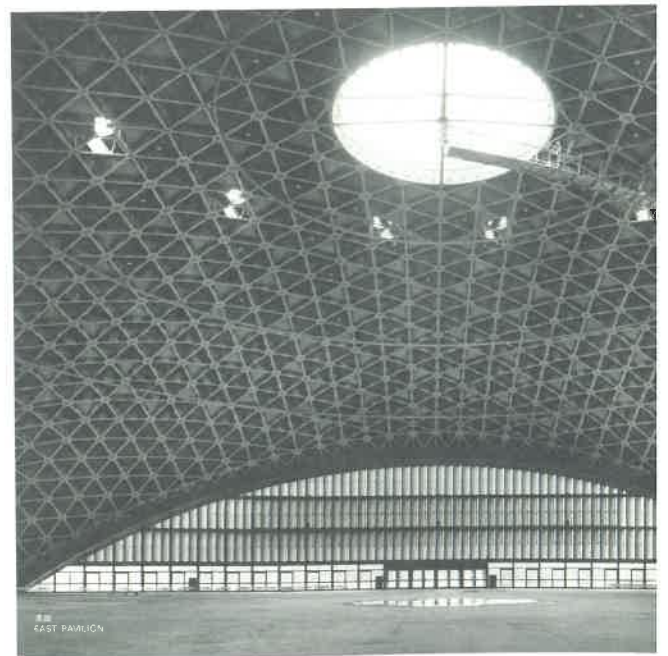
Masachika Murata. Tokyo International Trade Center. East Pavillon.
